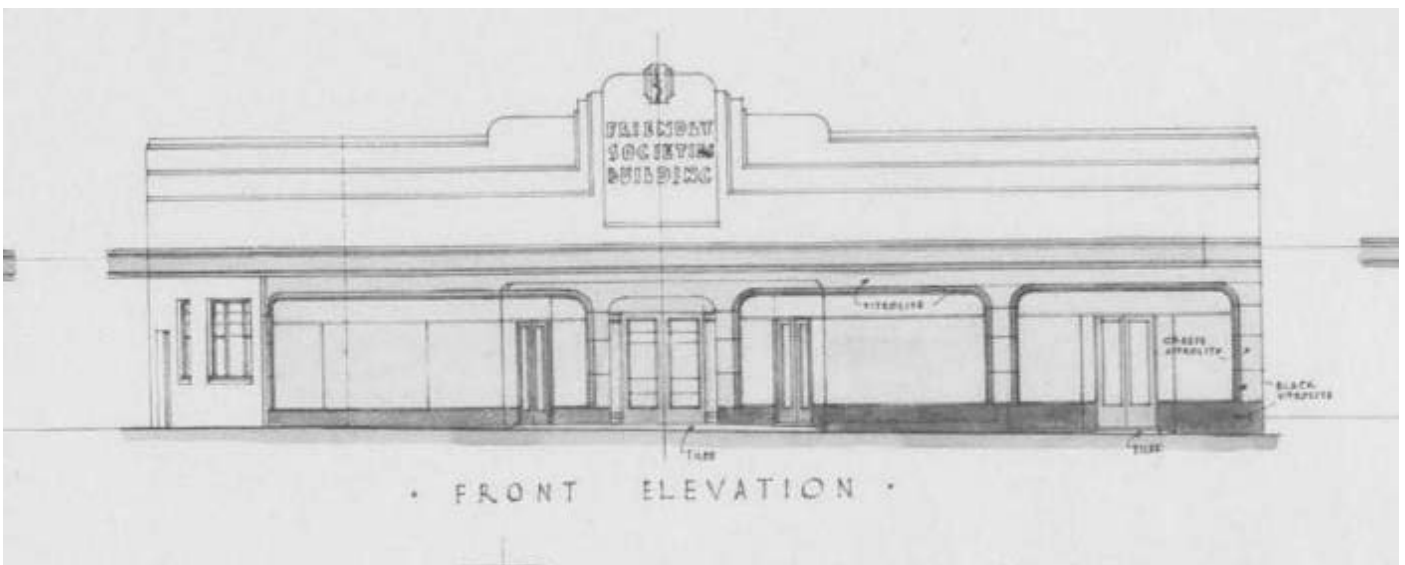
Original Plans for 553 Albany Highway, Victoria Park - Friendly Societies Building – façade
